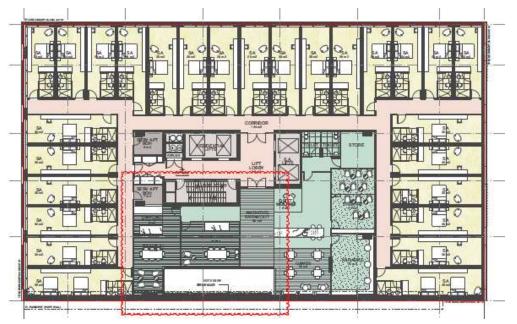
Amended plans - Level 4: Apartment gym and Terrace
